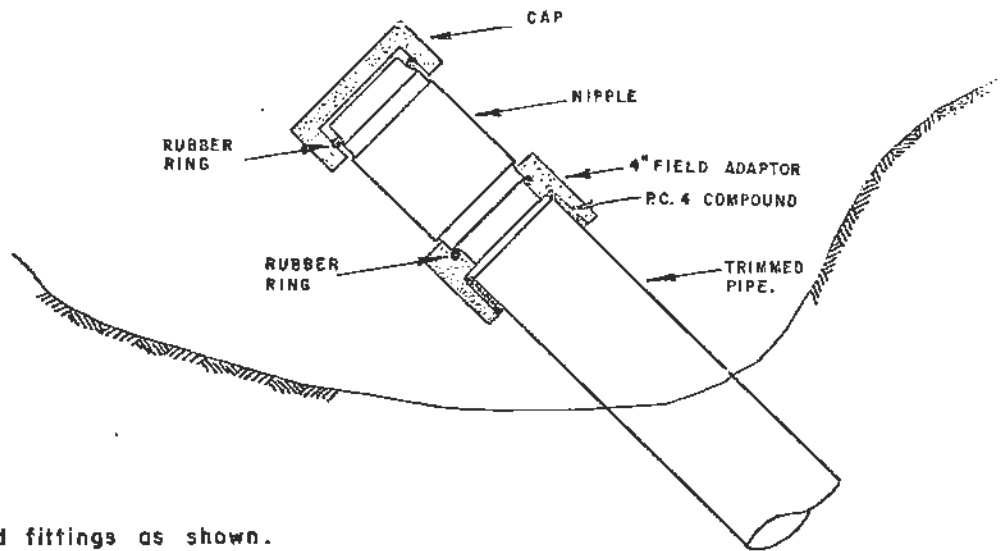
DETAIL OF LATERAL CONNECTION TO ASBESTOS - CEMENT TRUNK
